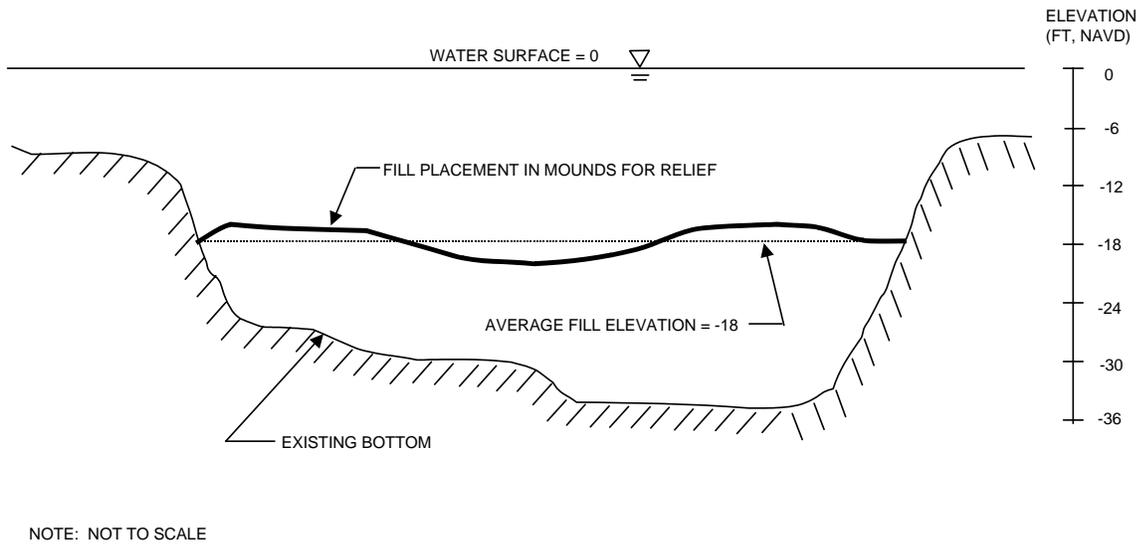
Schematic Cross-Section for Filling of Dredged Hole #6 to -18 ft.
